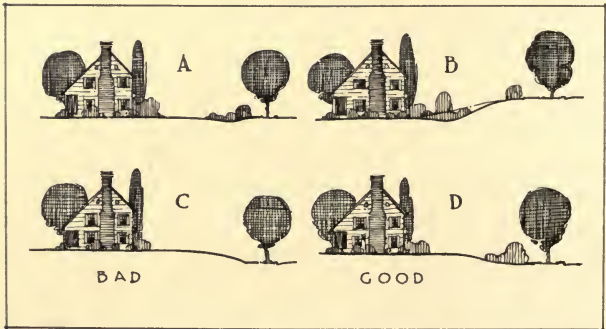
Showing methods of grading. (A) good arrangement when house is on same level as street; (B) when house is below street; (D) when house is above street; and (C) poor method not as satisfactory as (D).
